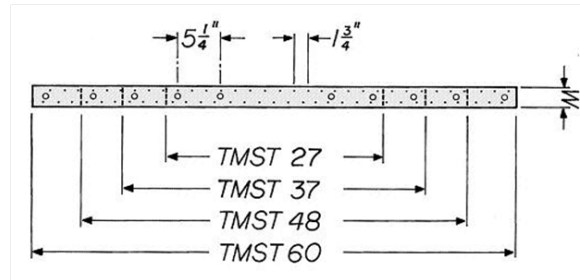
D—DRAWING SHOWING THE RELATIVE LENGTHS OF THE TMST STRAPS (TMST72 similar; TSI similar, but without bolt holes)
